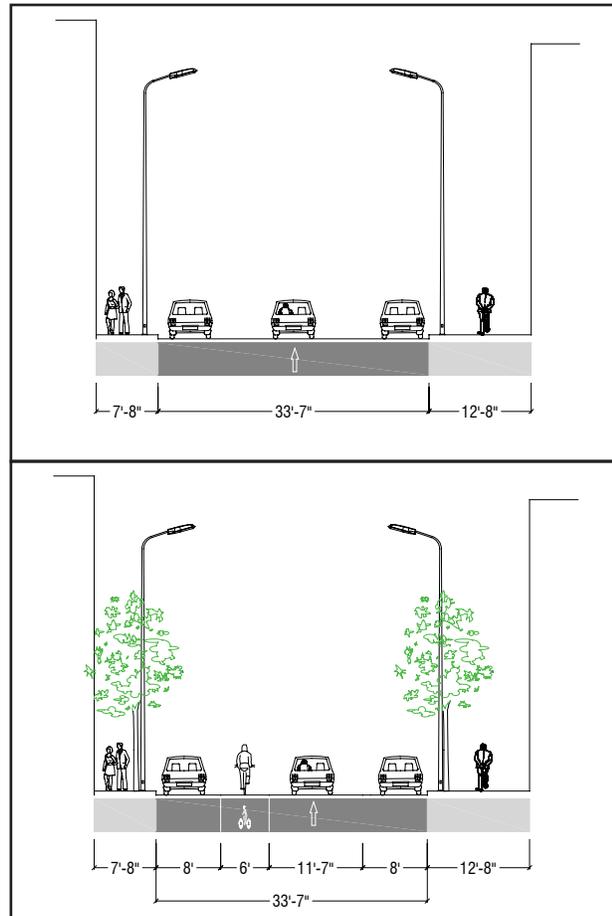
Section 1: Walton Avenue existing and recommended cross section (facing south)
